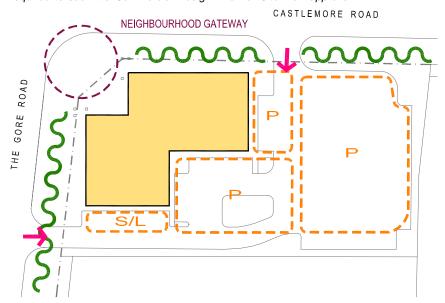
Neighbourhood Commercial demonstration plan A
